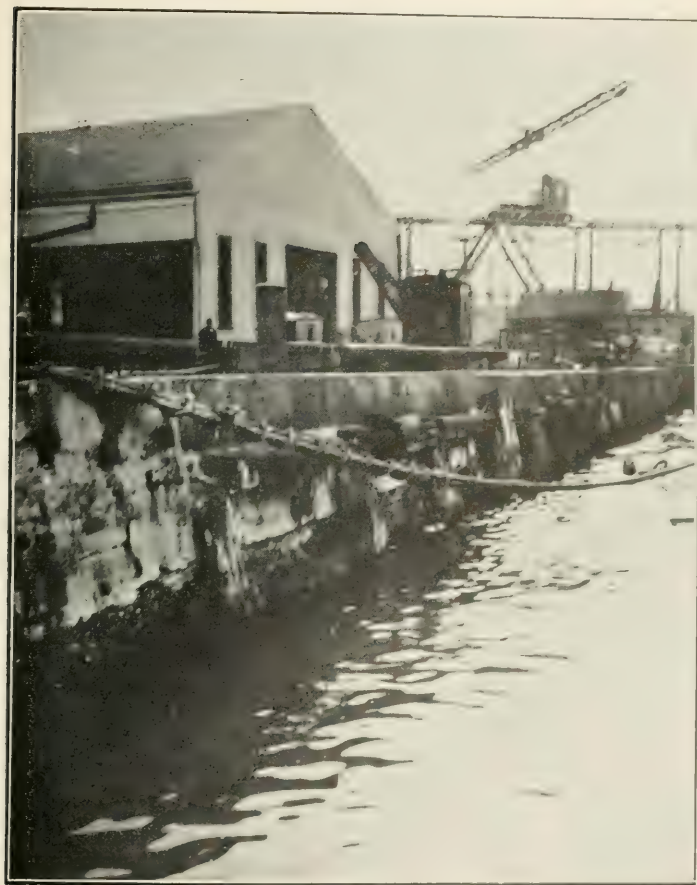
A CONCRETE BLOCK BADLY ERODED BY SALT WATER.
